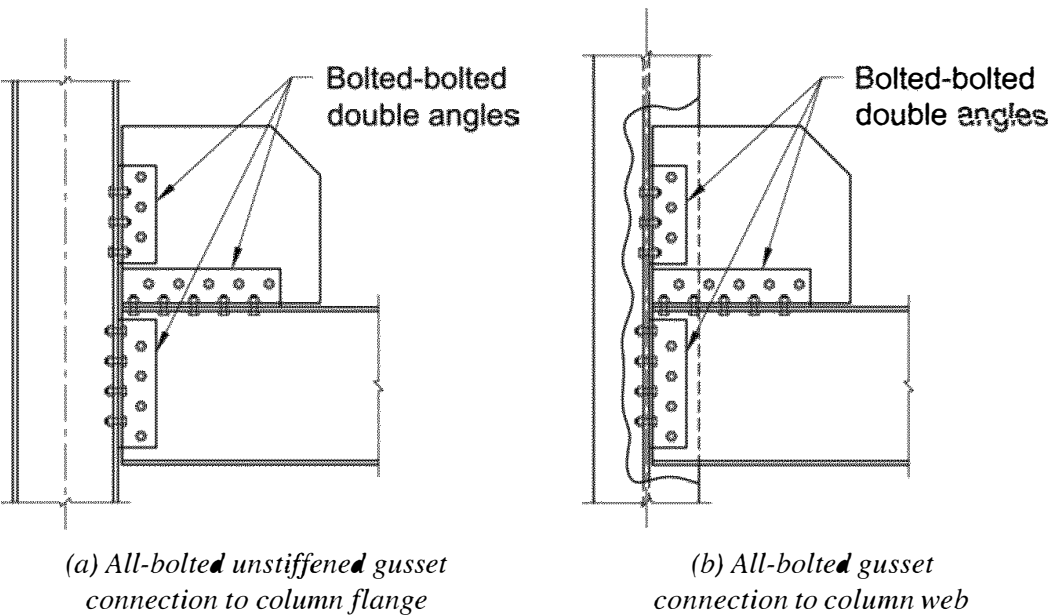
All-bolted beam-to-column connection that allows rotation (McManus et al., 2013).
